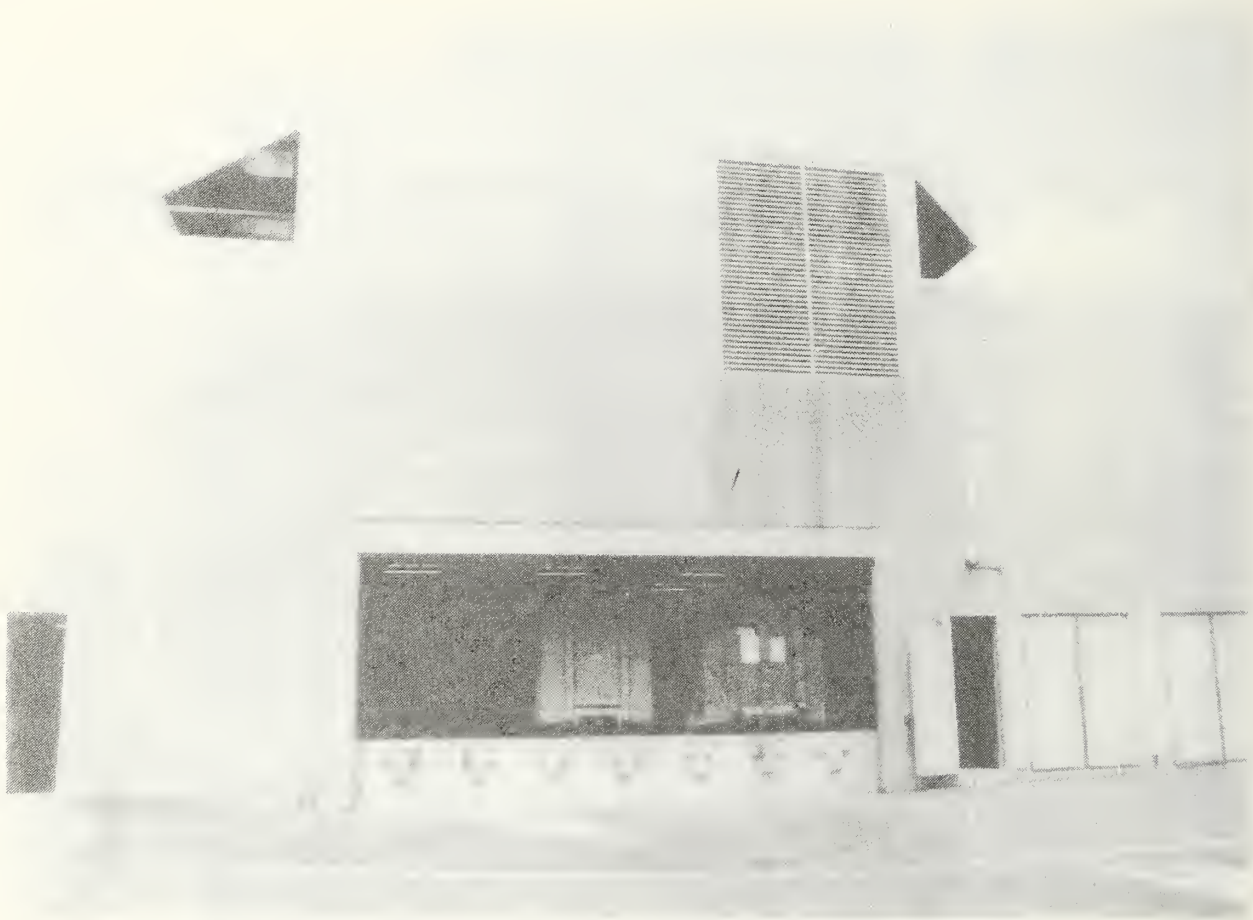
Front view of the central equipment building showing the loading dock with the trash containers
